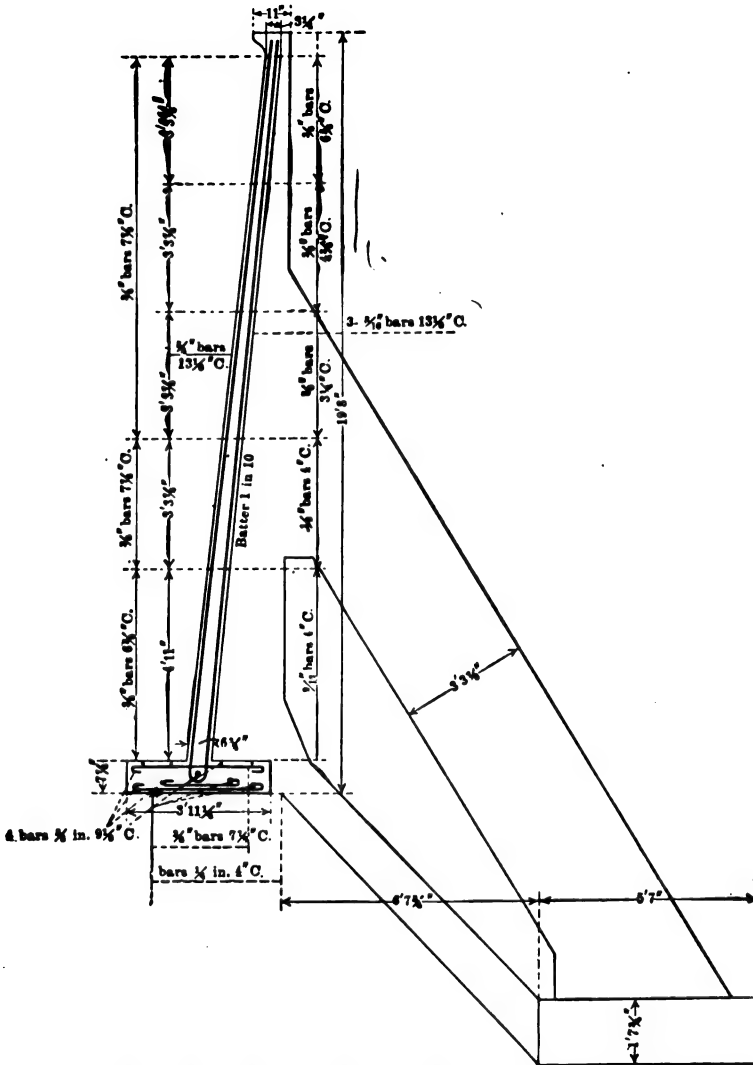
RETAINING WALL WITH ANCHORS, ALGIERS.
